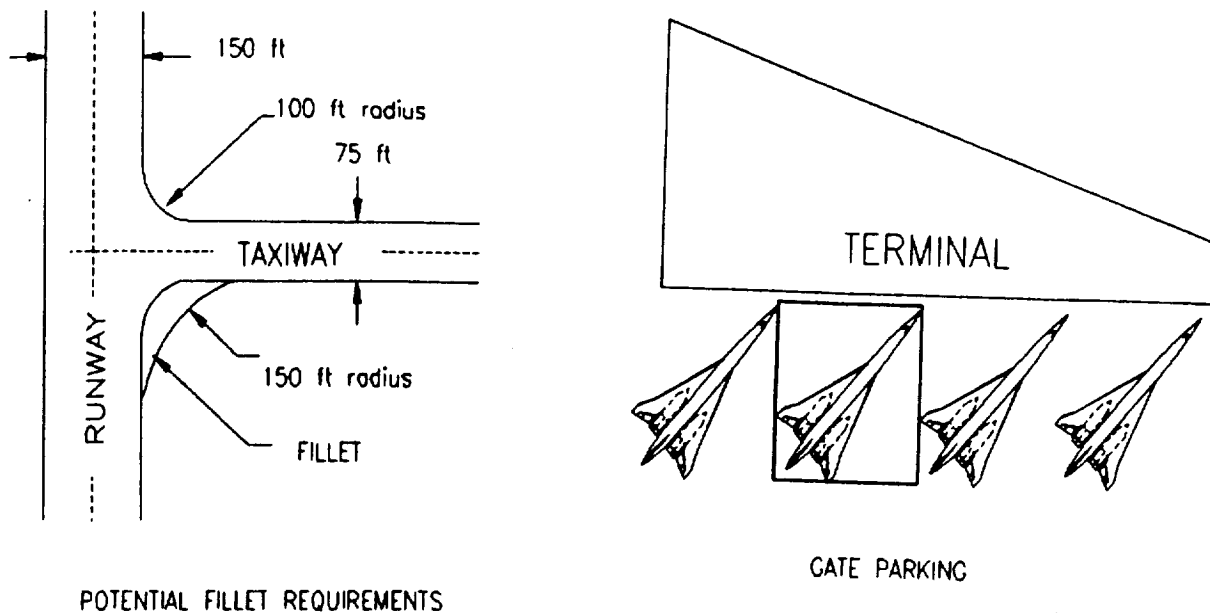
(a) Runway Fillet Requirements (b) Gate Parking
